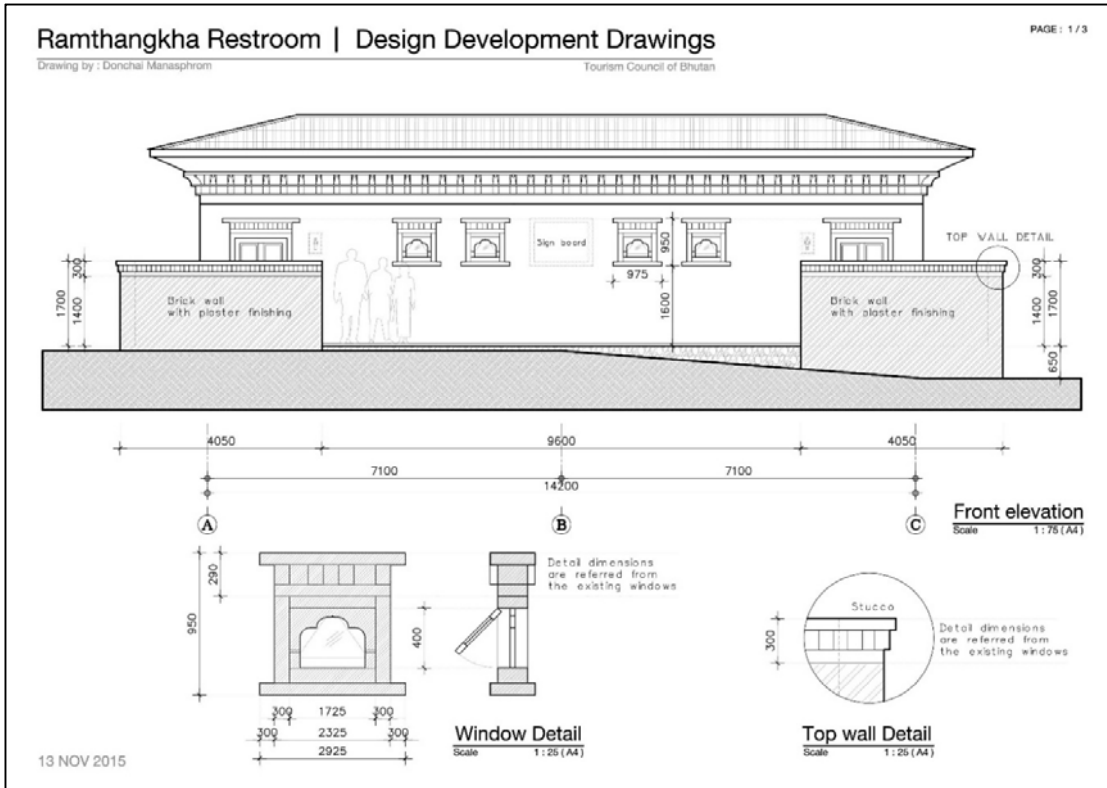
Renovation drawings of Ramthangkha (Taksang base) restrooms
